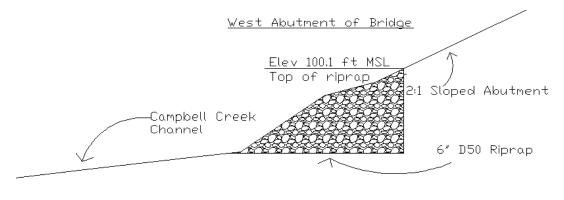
Typical Cross-Section of Bridge Riprap (West Side)
